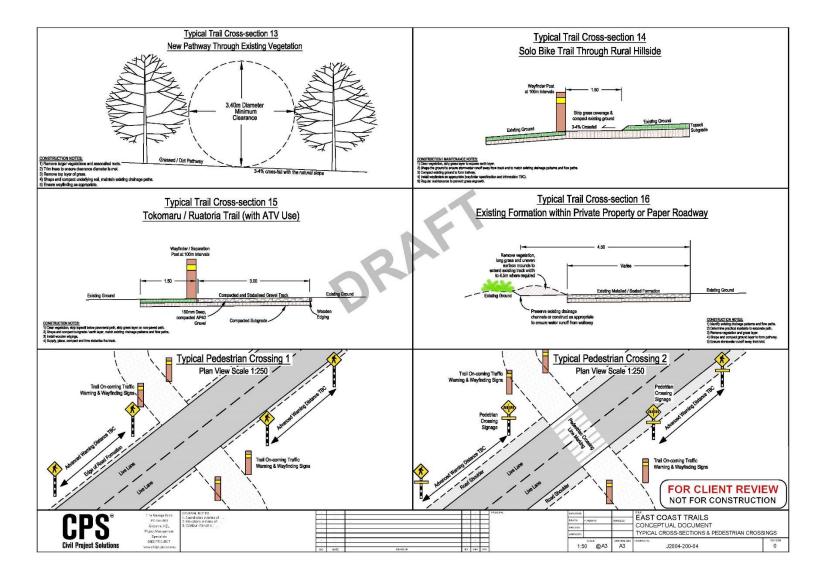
Concept drawings of the proposed trail tier constructions (Source: Civil Project Solutions).
